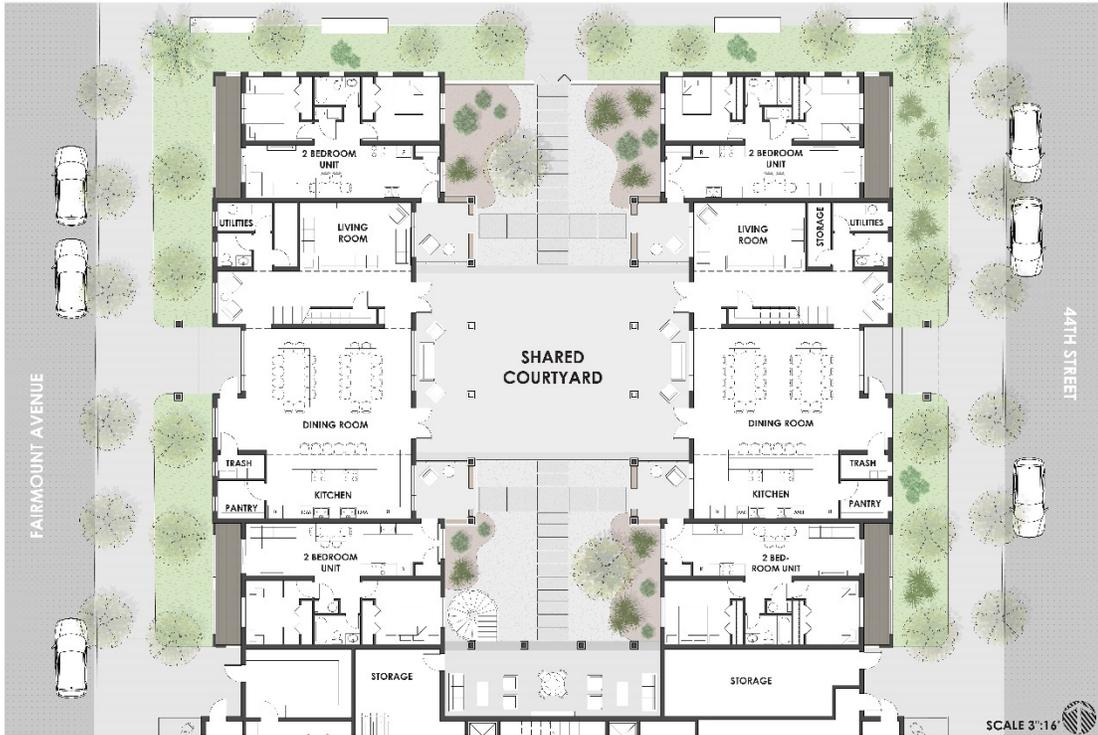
Co-Housing Ground Floor Plan (Source: Author)
